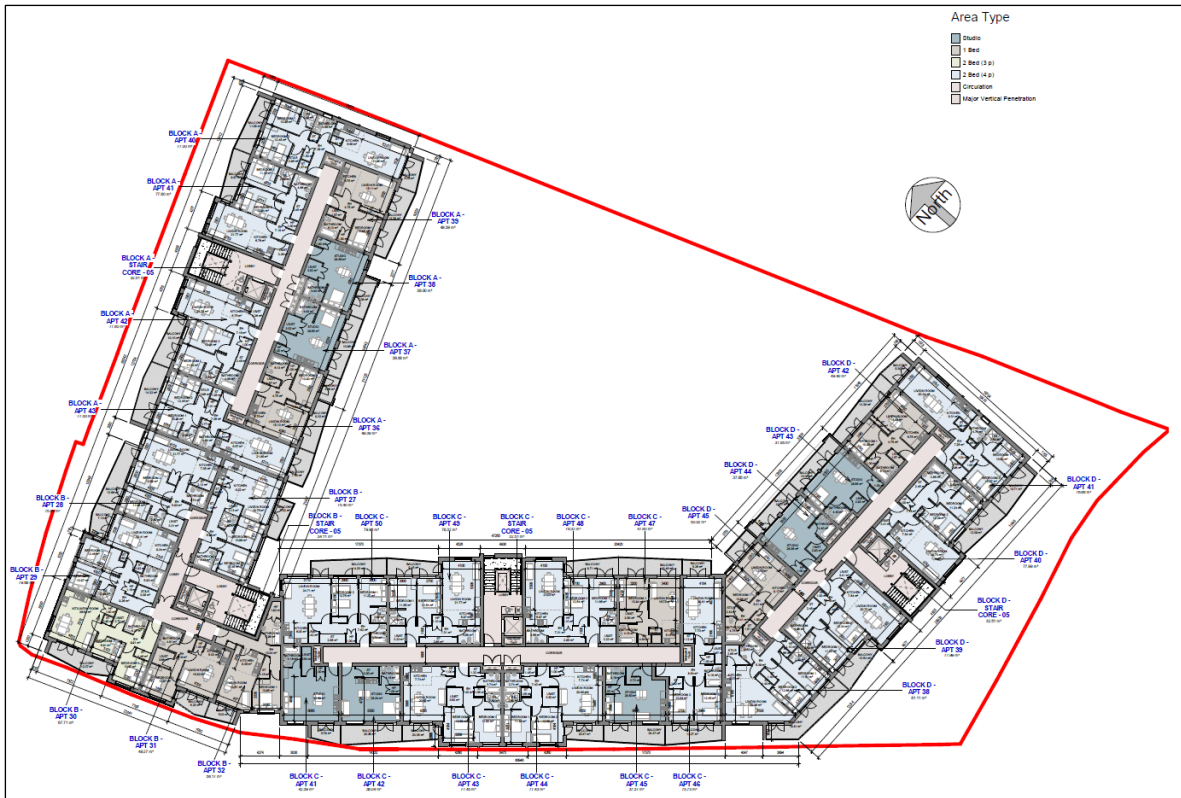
Fifth floor plan of development approved under ABP Ref. No. 303803-19
